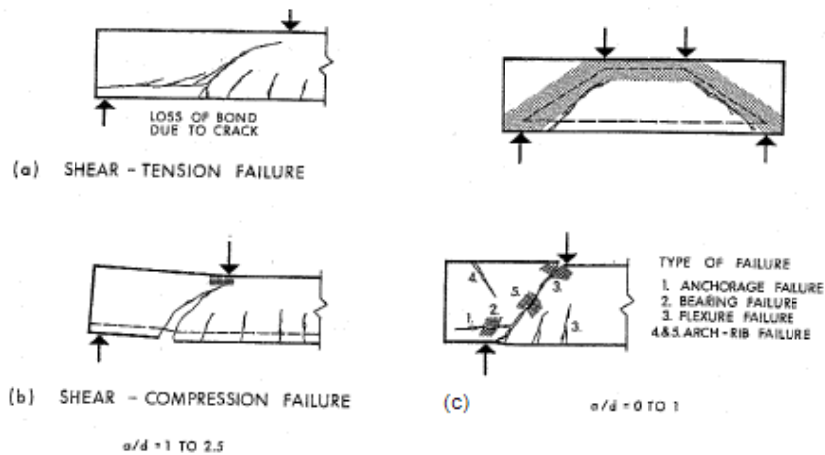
Typical shear failures in short beams and deep beams: (a) shear tension failure; (b) shear compression failure; (c) modes of failure of deep beams. (ASCE-ACI committee 426, 1973). Originally by Bresler and MacGregor (1967).
